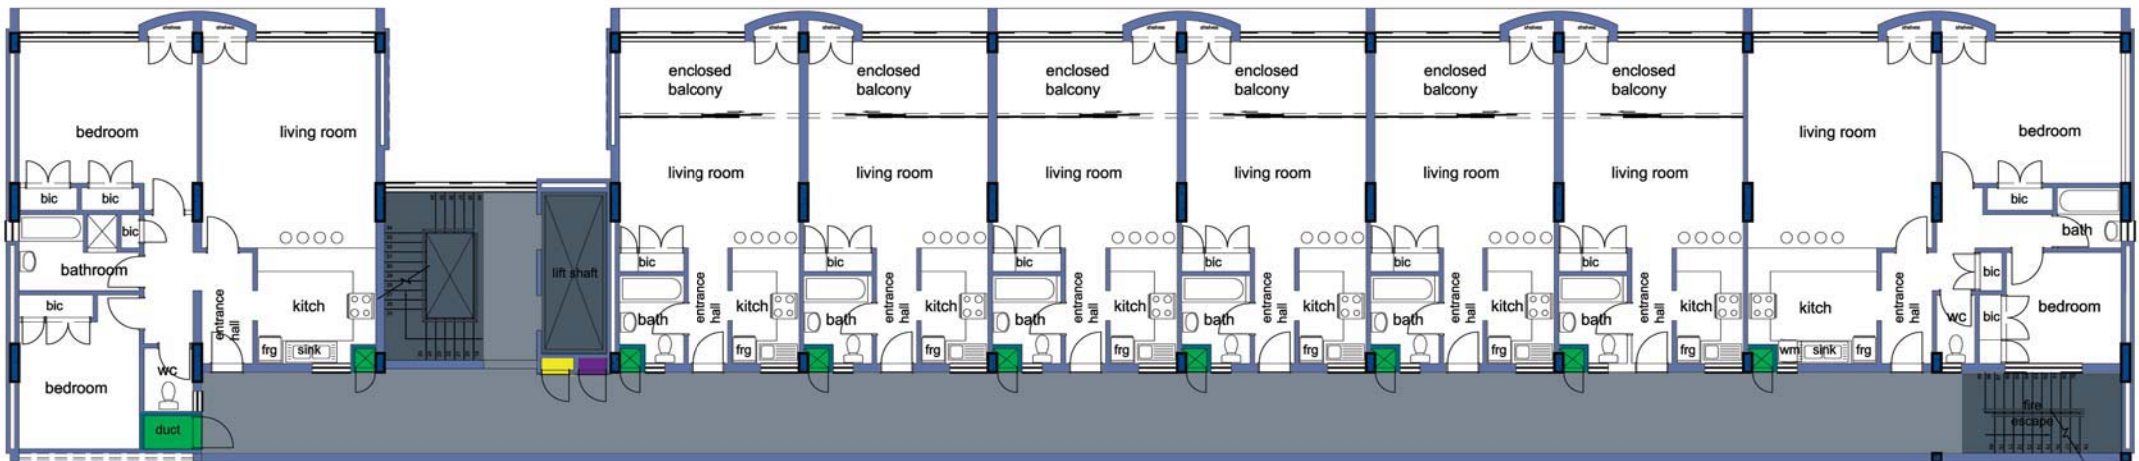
A plan with the various overlays of structure, services and circulation. This clearly illustrates that the southern side of the building is the most private. The spaces become more private towards the north once one is inside the residential unit.
